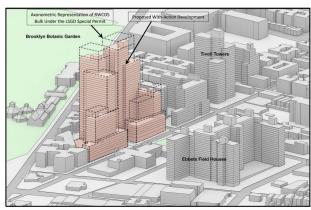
960 Franklin Avenue Proposal- 2 39-story buildings
